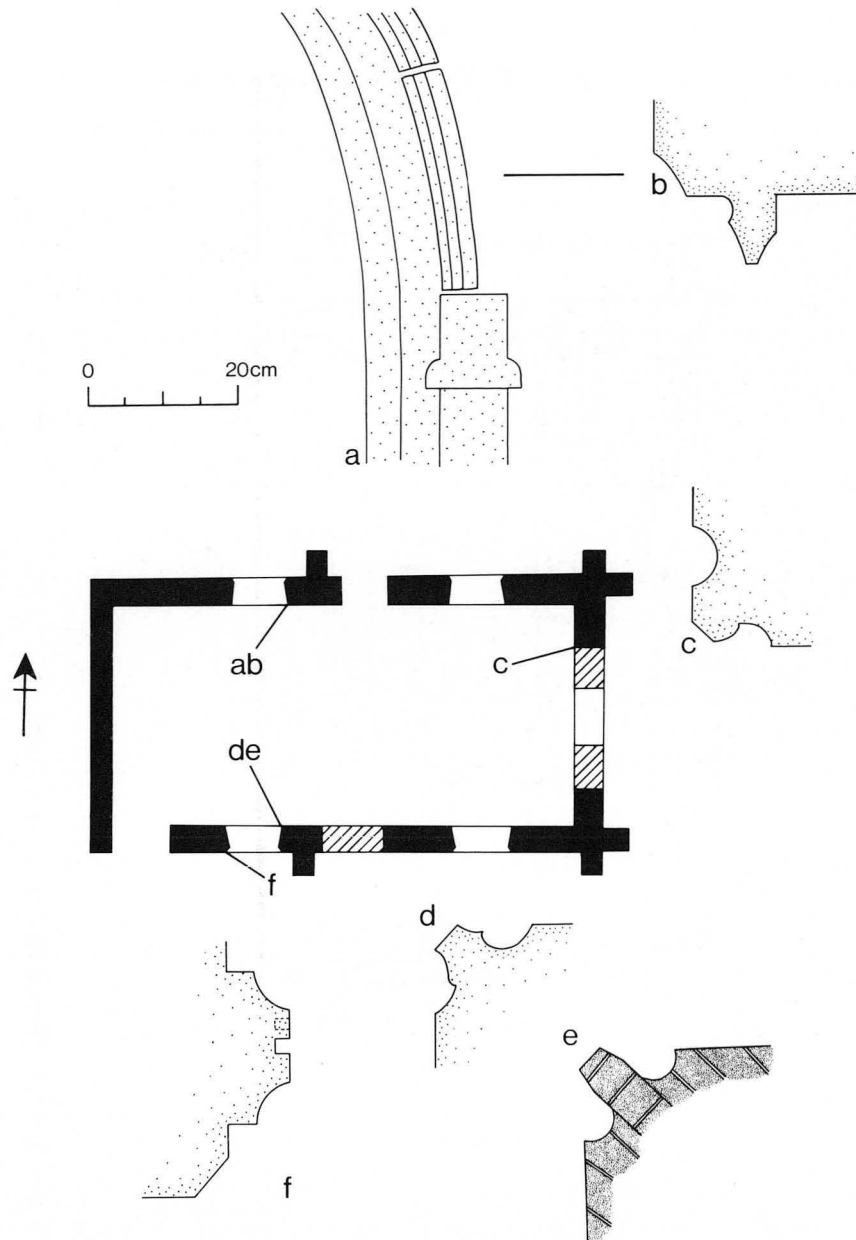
Architectural details of window mouldings in the chancel. Scale 1:10 (plan not to scale)
